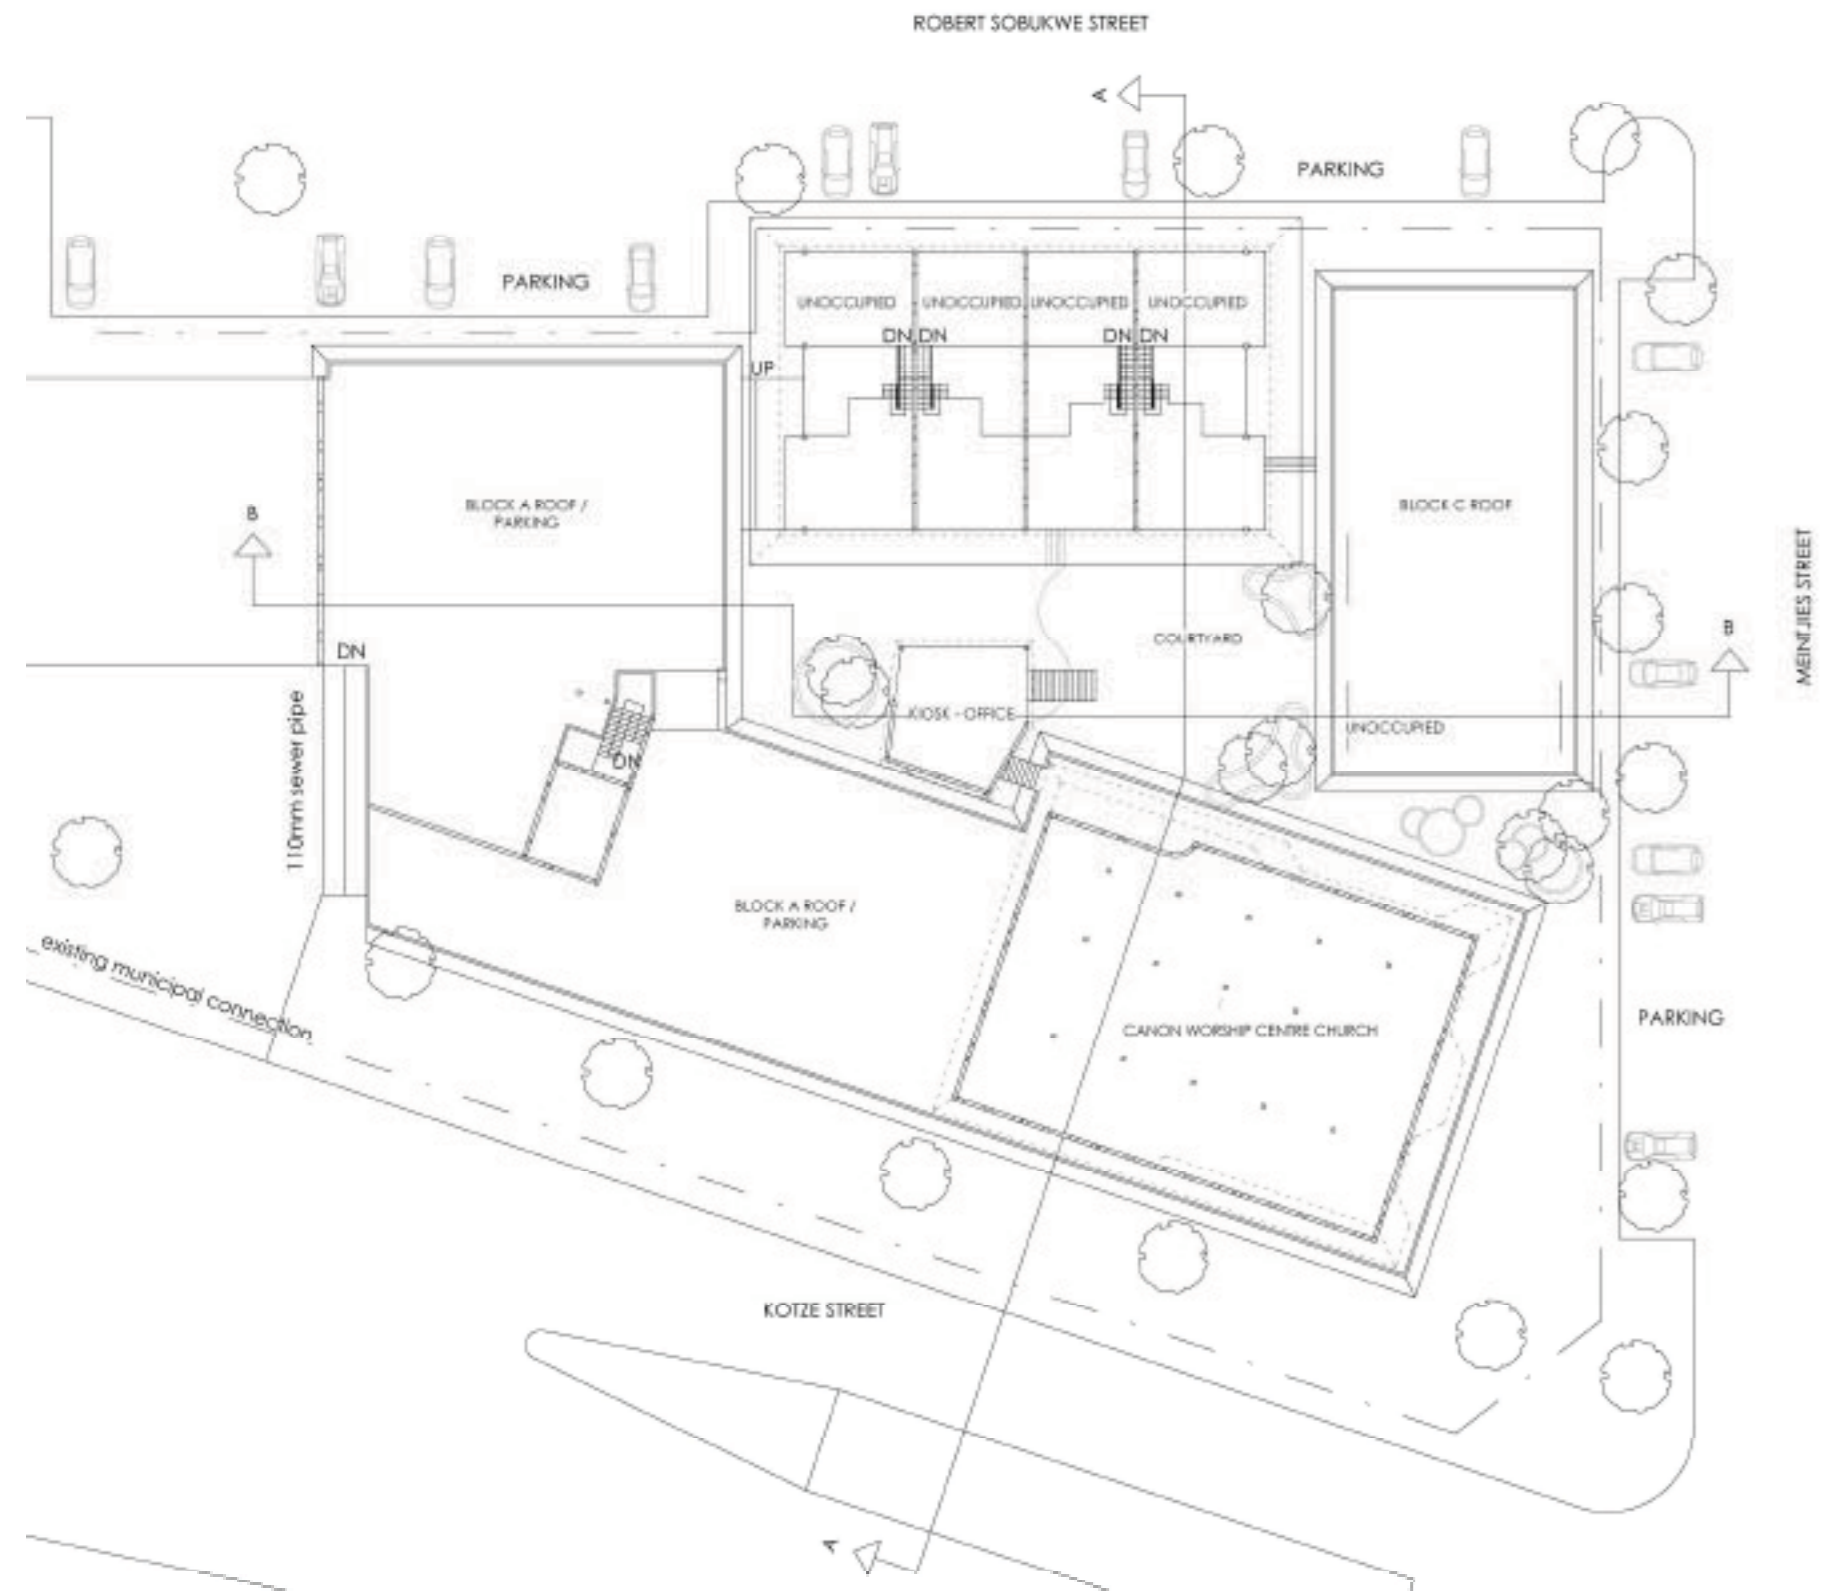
Existing First Floor Plan Scale 1:500
